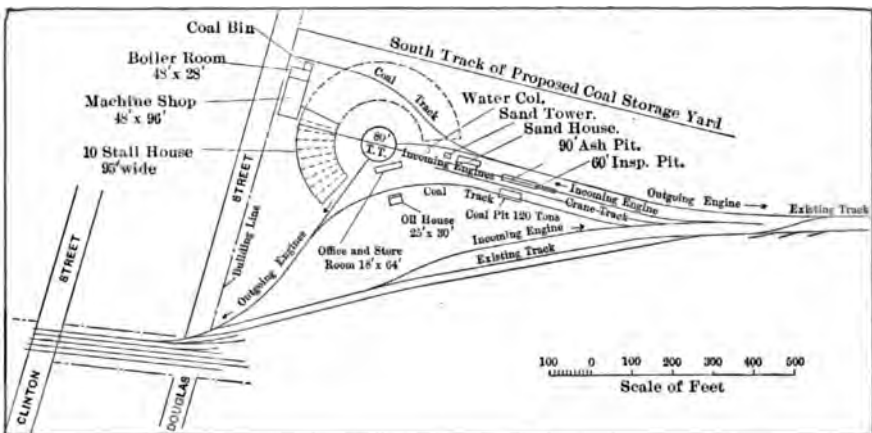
Engine-house and facilities, Collinwood, Ohio—Lake Shore.
